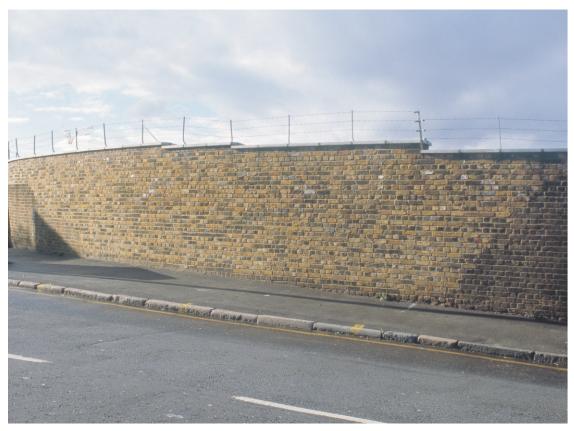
Repaired section of the wall on the site of the former Hydraulic House, looking west
